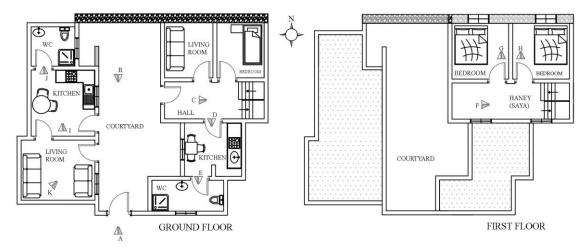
Empty house, ground and first floor plans (S.Sevimbige archive, 2017)
